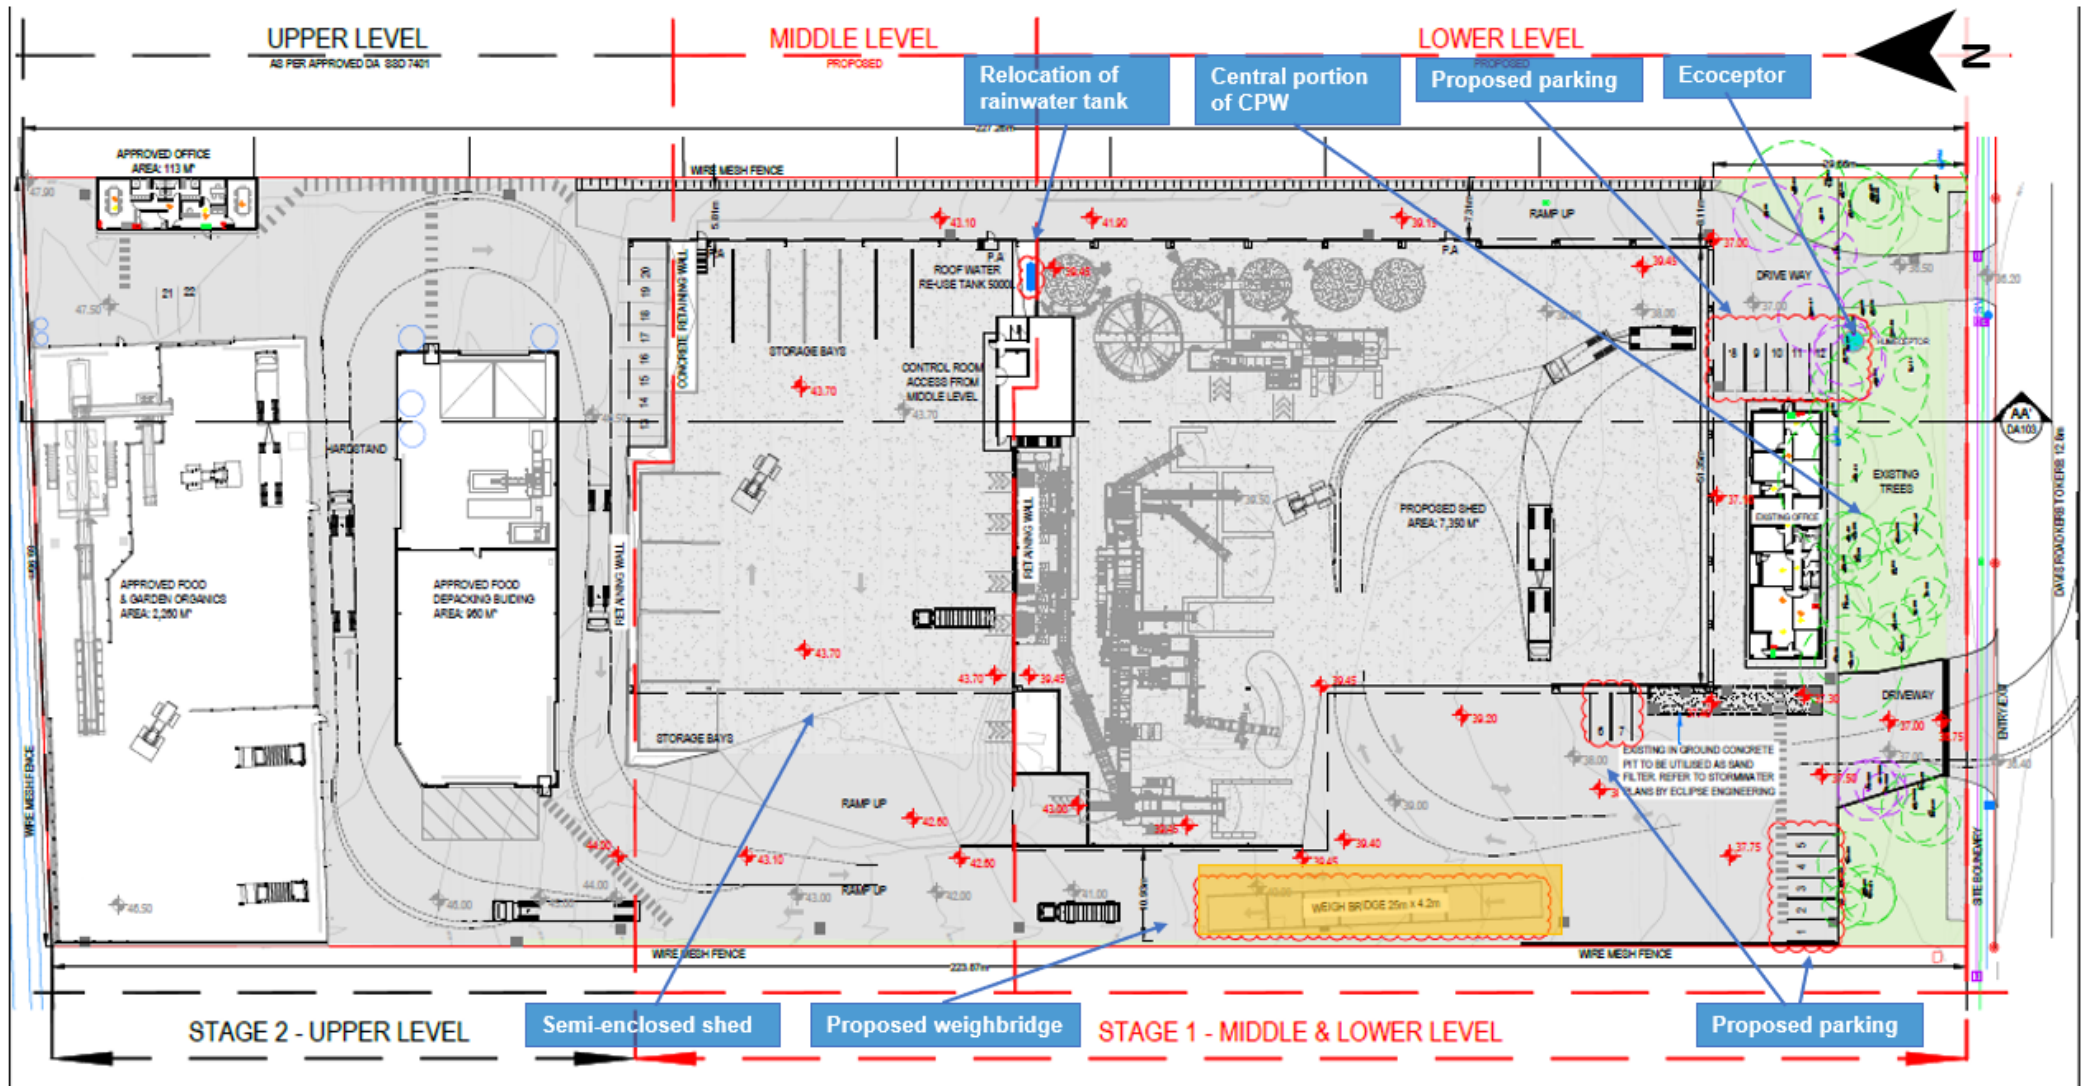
| Proposed Site Plan at Ground Level (DA004 Issue D) SSD-7401-Mod-3
